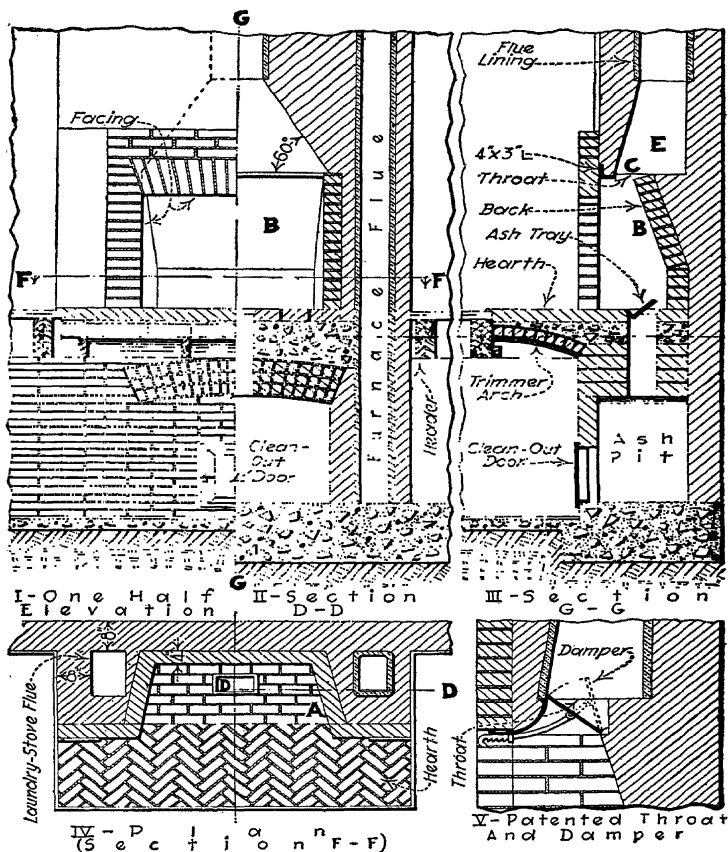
Typical open-fireplace construction. (*International Correspondence Schools' Building Trades Handbook.*)
